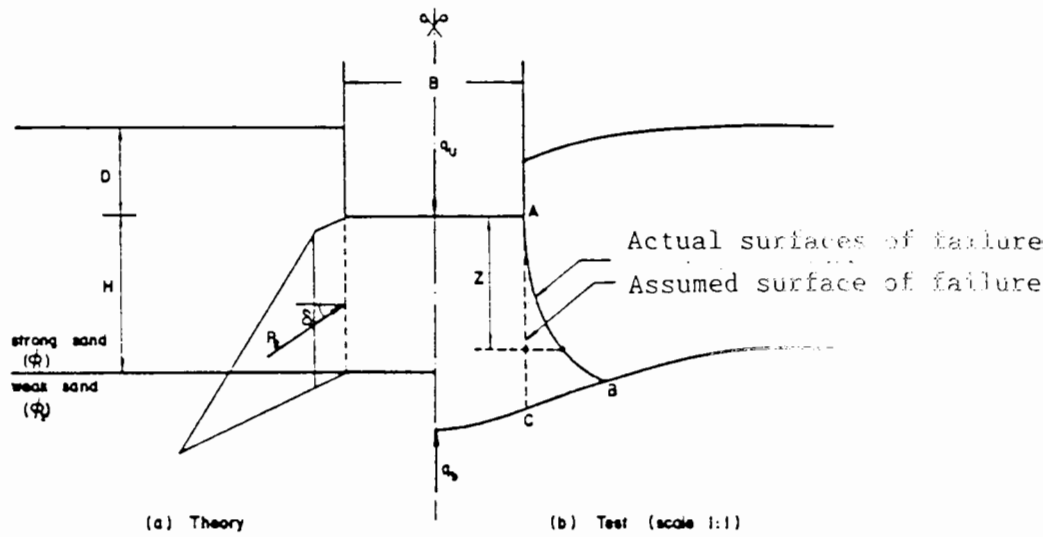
Failure modes of a strip footing on strong sand overlying weak sand (after Hanna, 1981)
